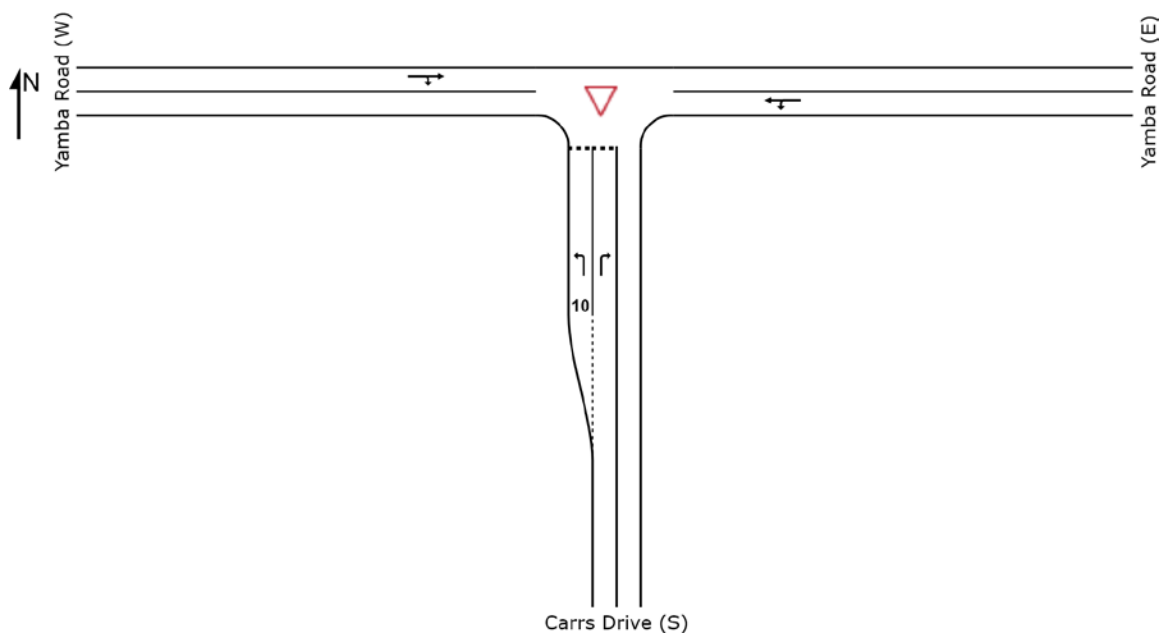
Carrs Drive / Yamba Road Intersection – Existing Geometry
